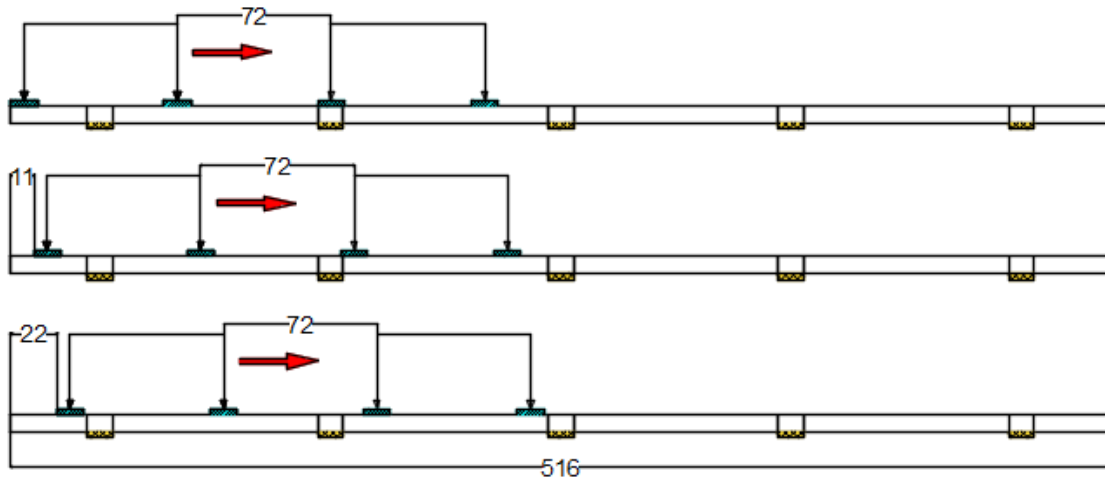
The placement of two HL-93 truck load on the deck slab with 9 ft girder spacing (first three combinations of Case 3.5, unit: in)
